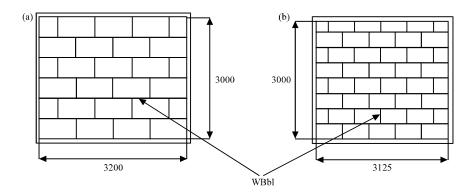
Comparative assessment of walling fragments: a) fragment of heat-insulating constructional glass-composite blocks wall and b) fragment of gas-concrete blocks wall
